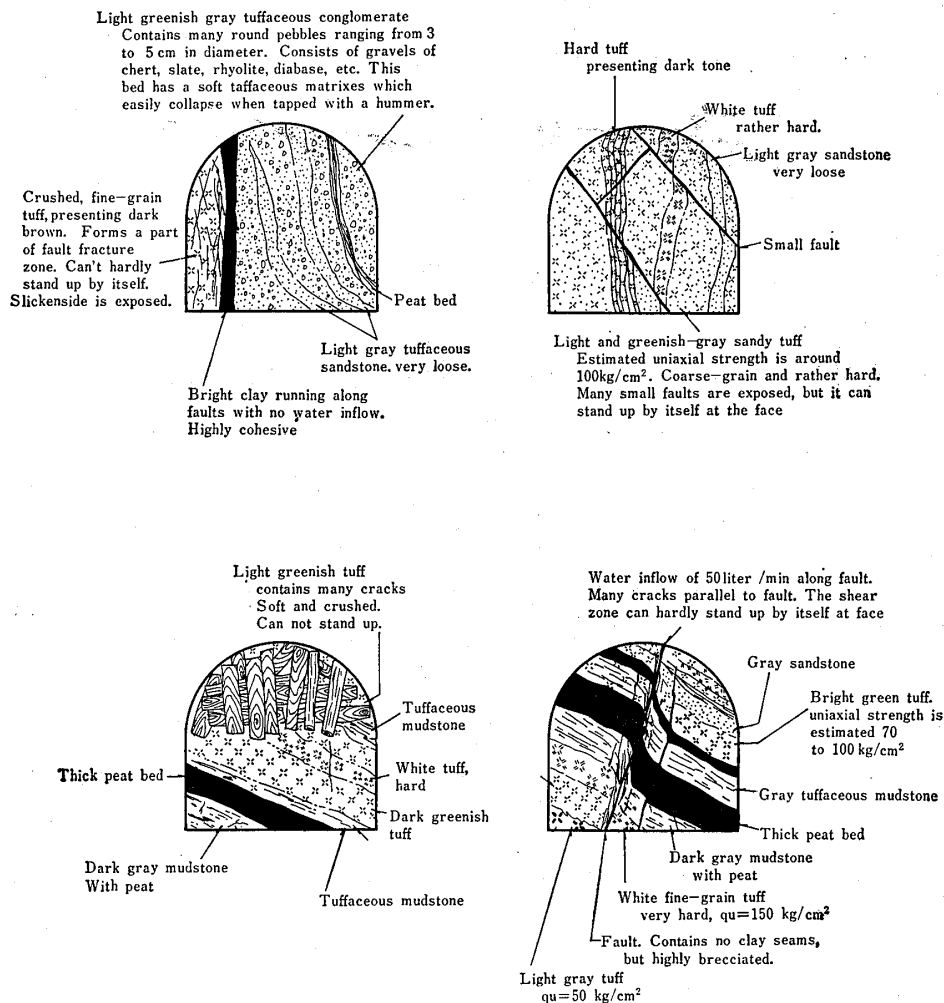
Some sketches of tunnel faces to illustrate makeup of layers
